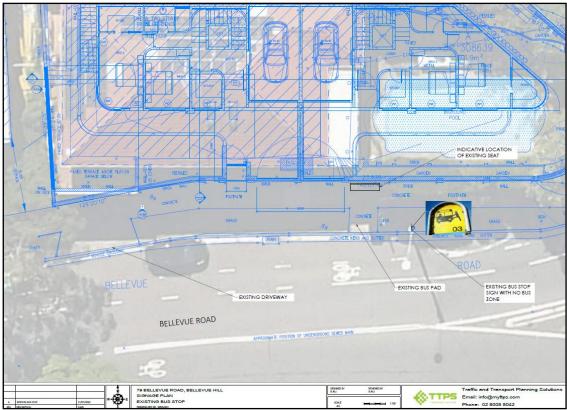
Traffic Plan showing existing driveway and bus stop. Source: Submitted Traffic Report
